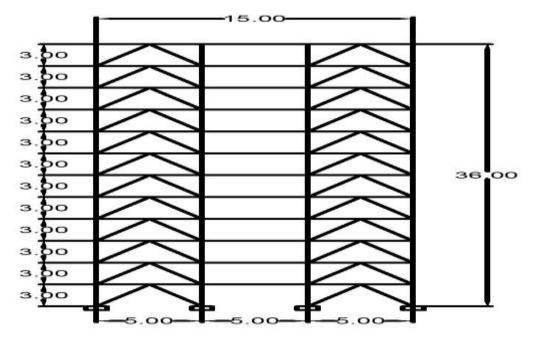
Elevation of 12 storey building with inverted V-bracing in transverse direction
